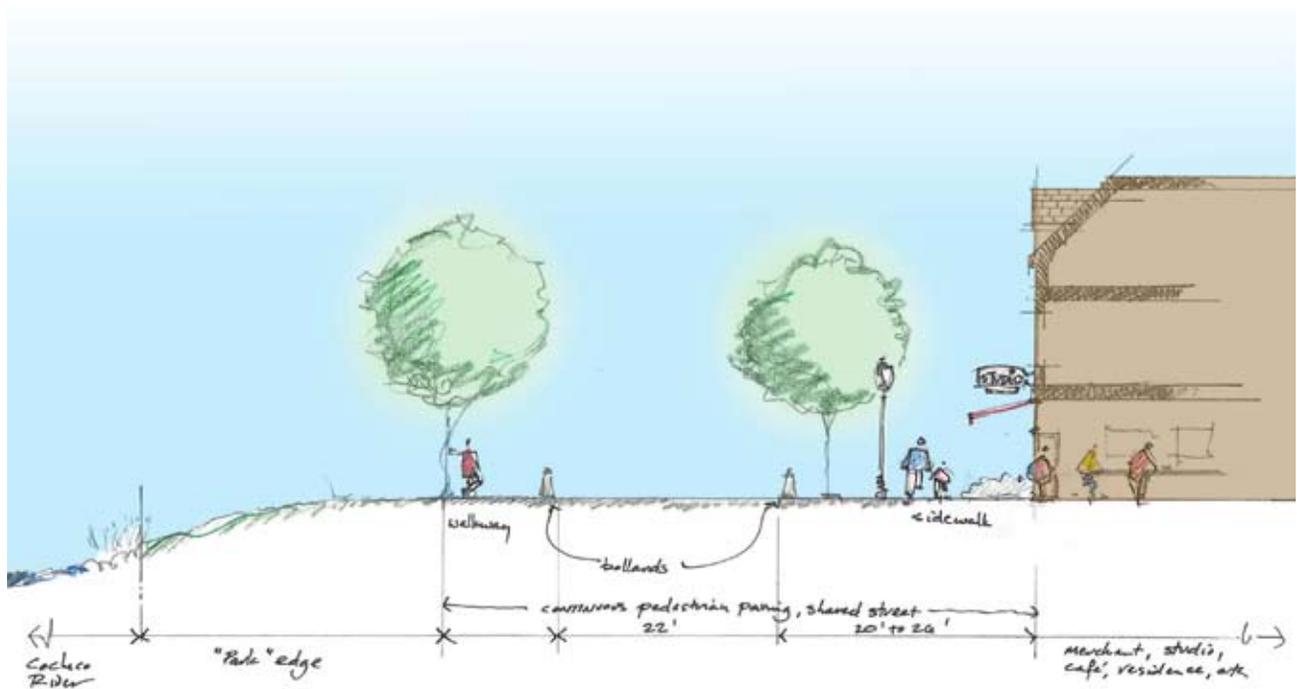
Section Diagram, Alternative Configuration: Riverfront Building, Street and Open Space Relationships
